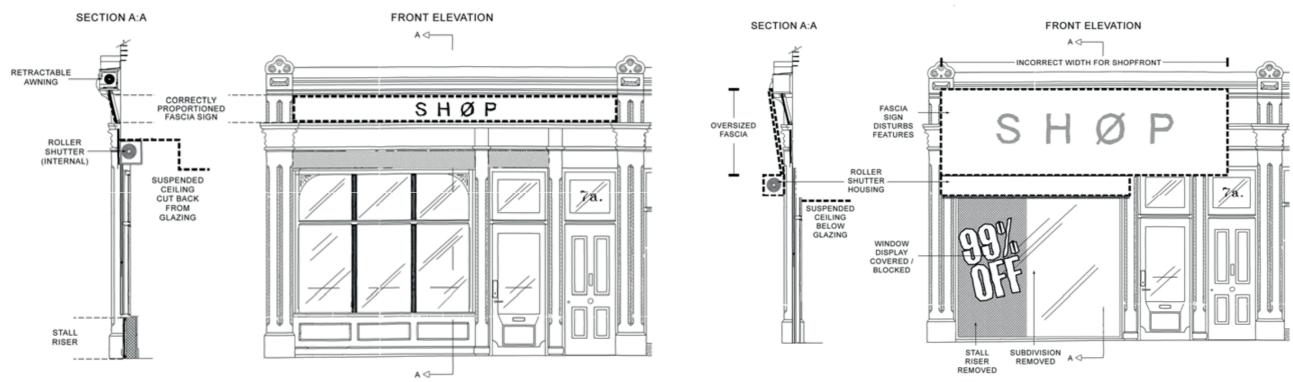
Camden Planning Guidance - Shopfront Standard
